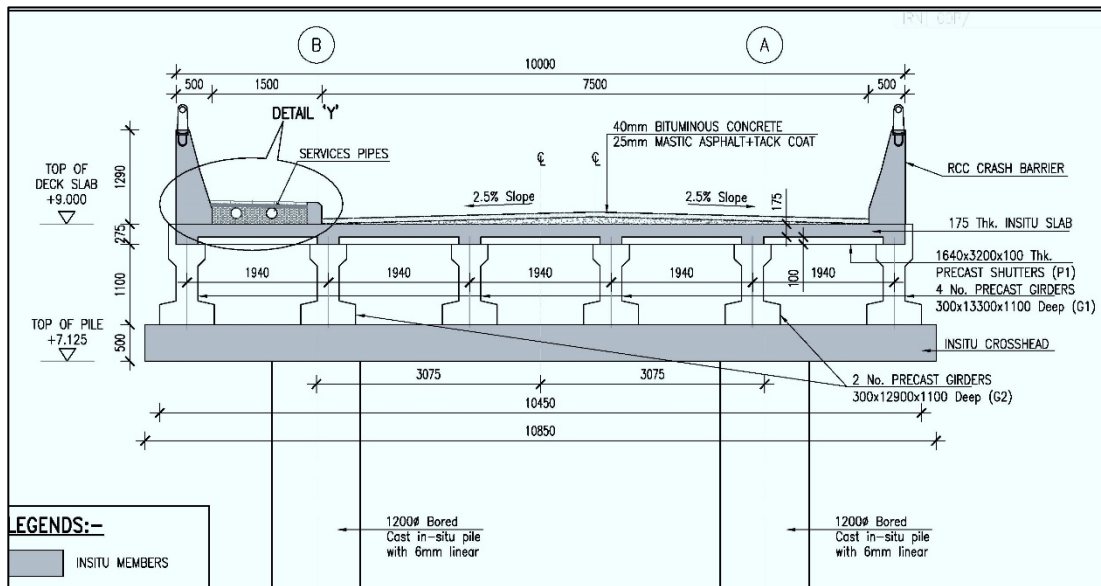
16: Section Showing The Details Of The Approach (Typical)
